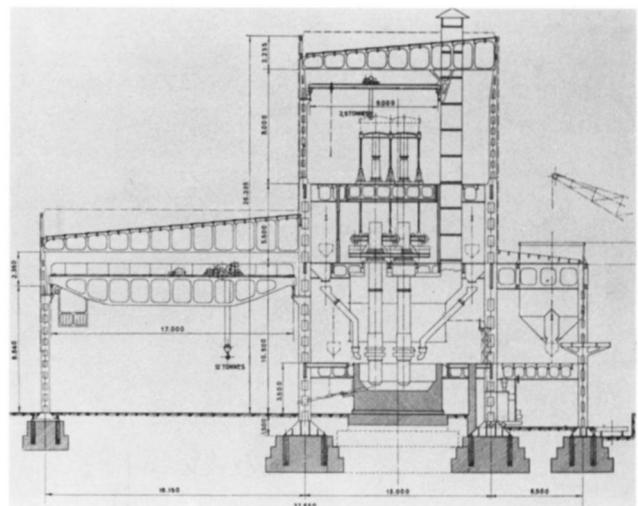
Savone, new ILVA Steelworks, A. Bozzarelli, 1939. Transverse building section (*L'Ossature Metallique*, March 1940).
